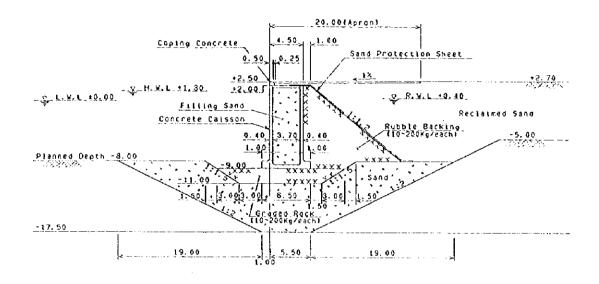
(3) Typical Cross Section of Quaywall E1 (RC Caisson)
